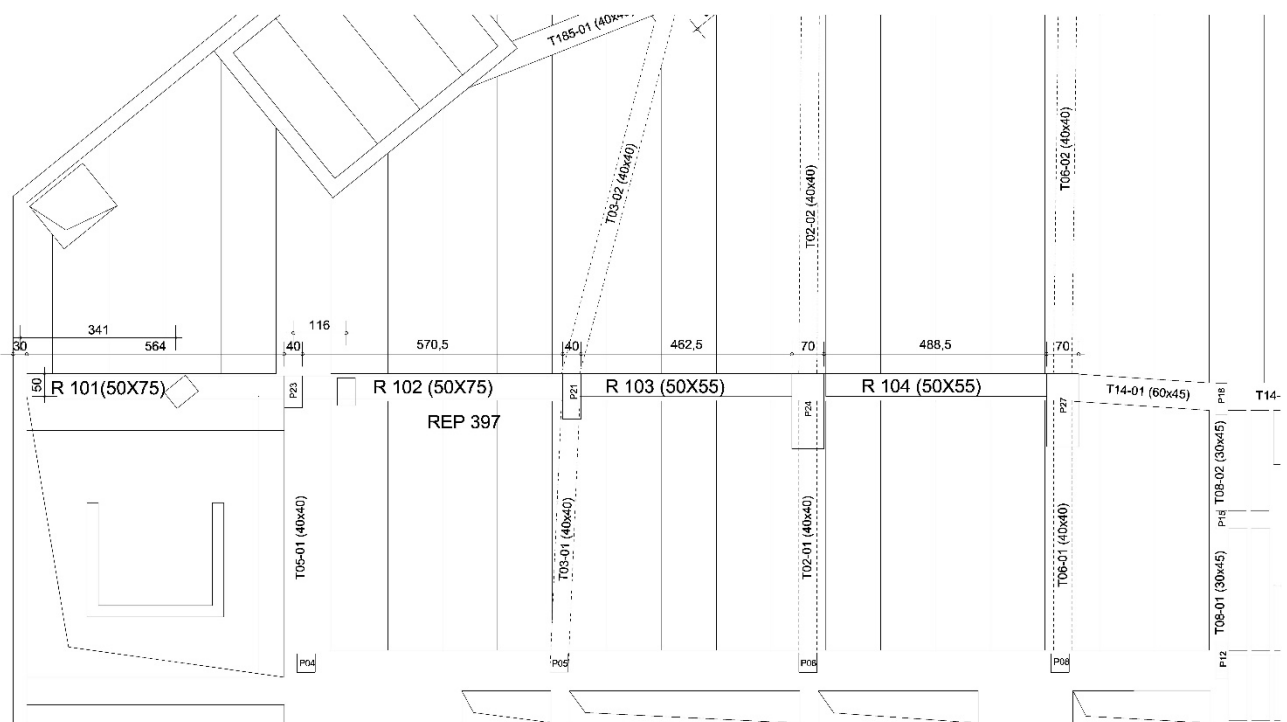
Structural design plan of “floor -1” to show CSTCBs R101, R102, R103, R104.
